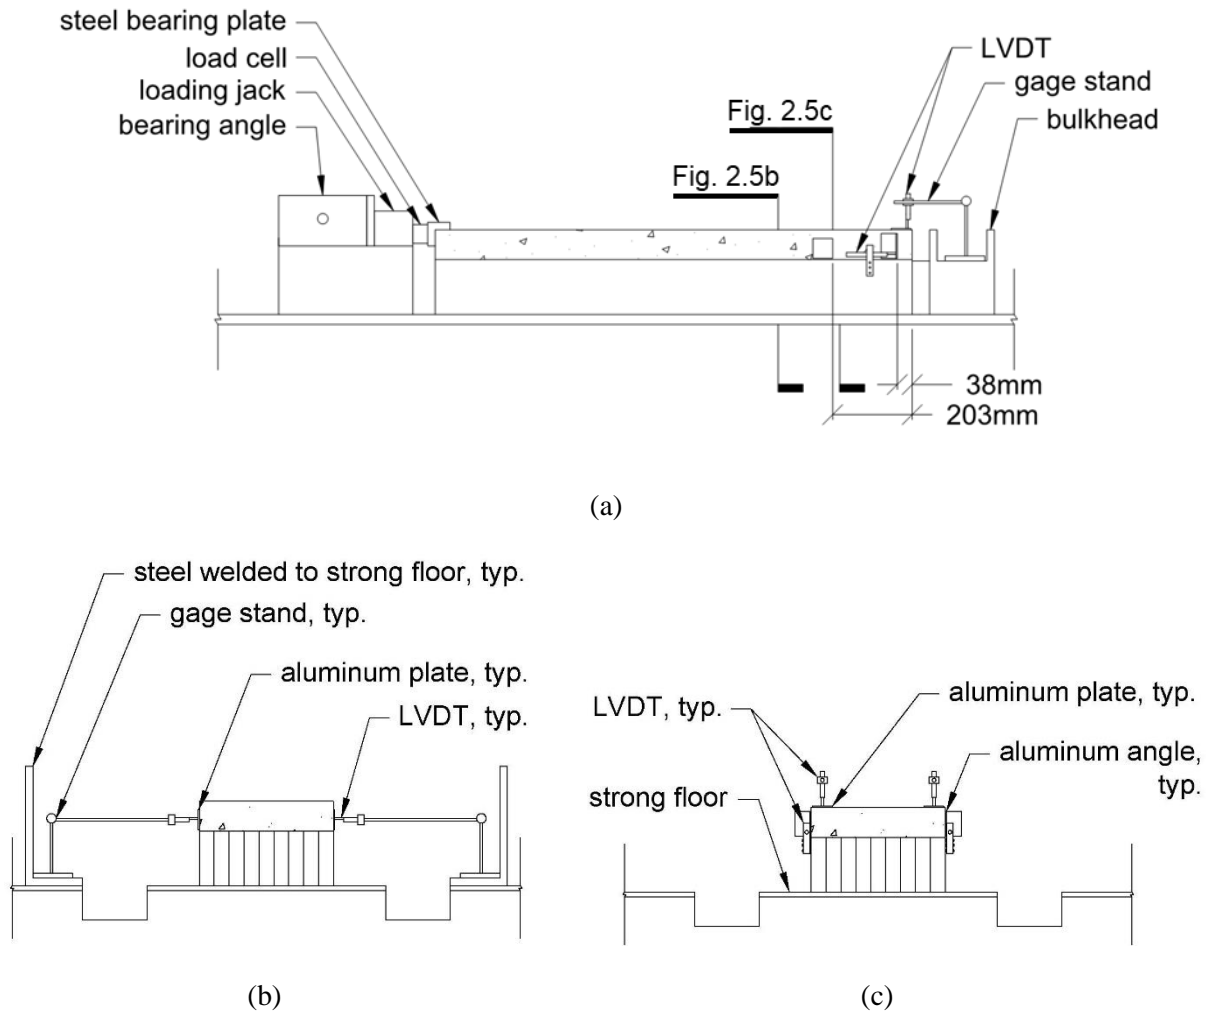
Test set-up for the NLT-concrete composite specimen (a) elevation view of test set-up, (b) section showing the location of LVDTs measuring the in-plane rotation of the specimen, and (c) section showing the location of LVDTs measuring uplift and horizontal movement of the timber relative to the concrete
